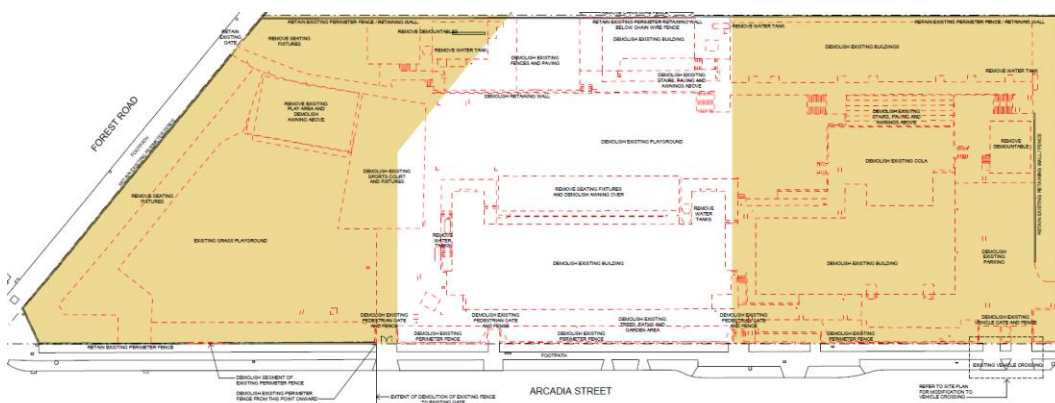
Extract of Demolition Site Plan (prepared by Perumal Pedavoli Architects)
